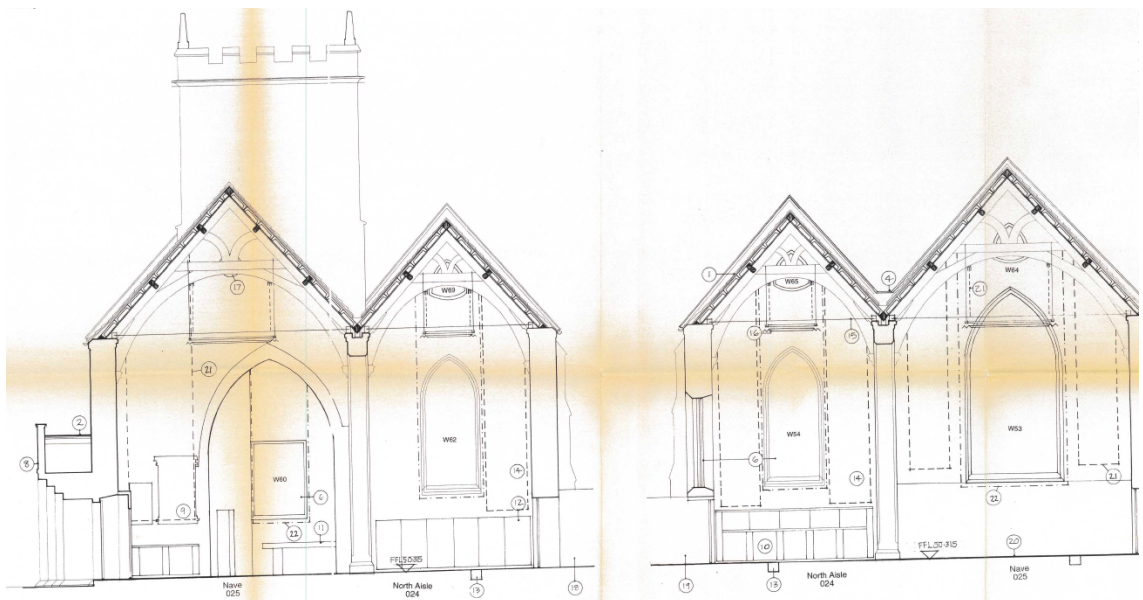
West and East Cross Sections of St. Margaret's Church as proposed [187].
